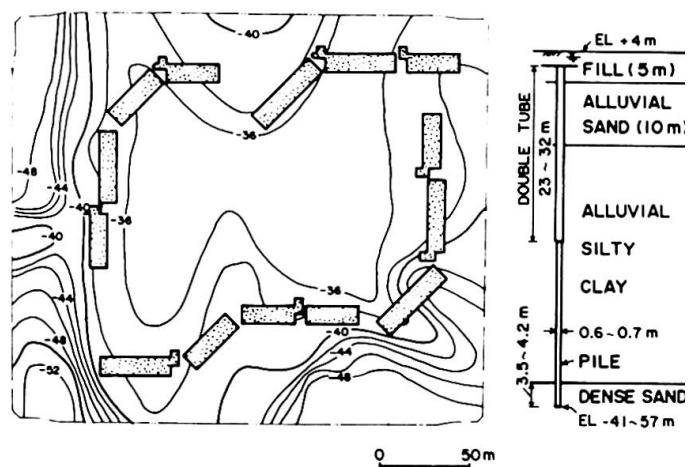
High-Rise Residential Buildings in Urayasu, Japan. (Numbers along contours show elevations of dense sand supporting point-bearing piles. Photo courtesy of Oriental Land Co., Ltd.)
